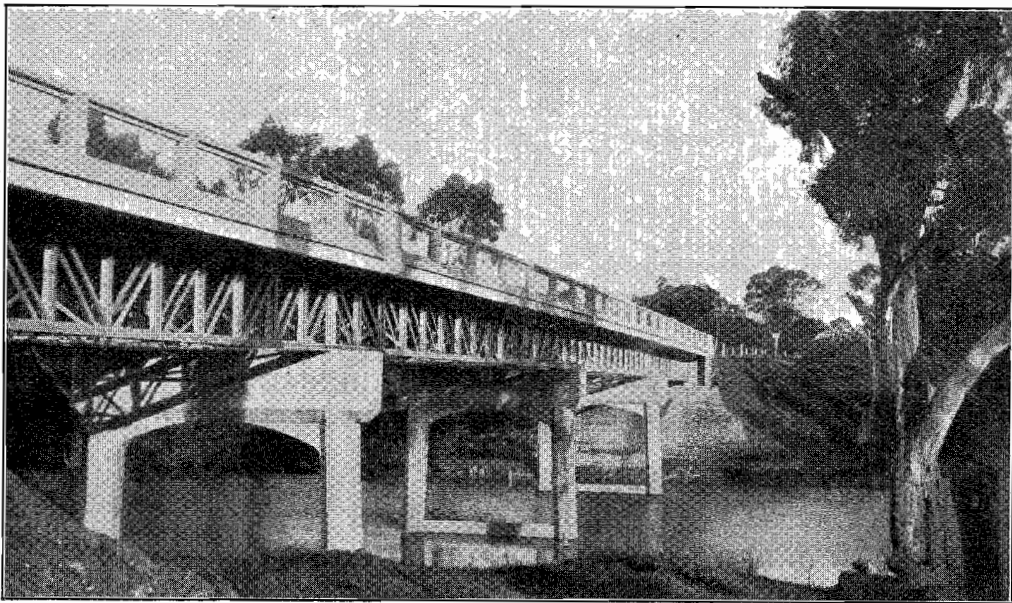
Hume Highway. Bridge over Sunday Creek.
